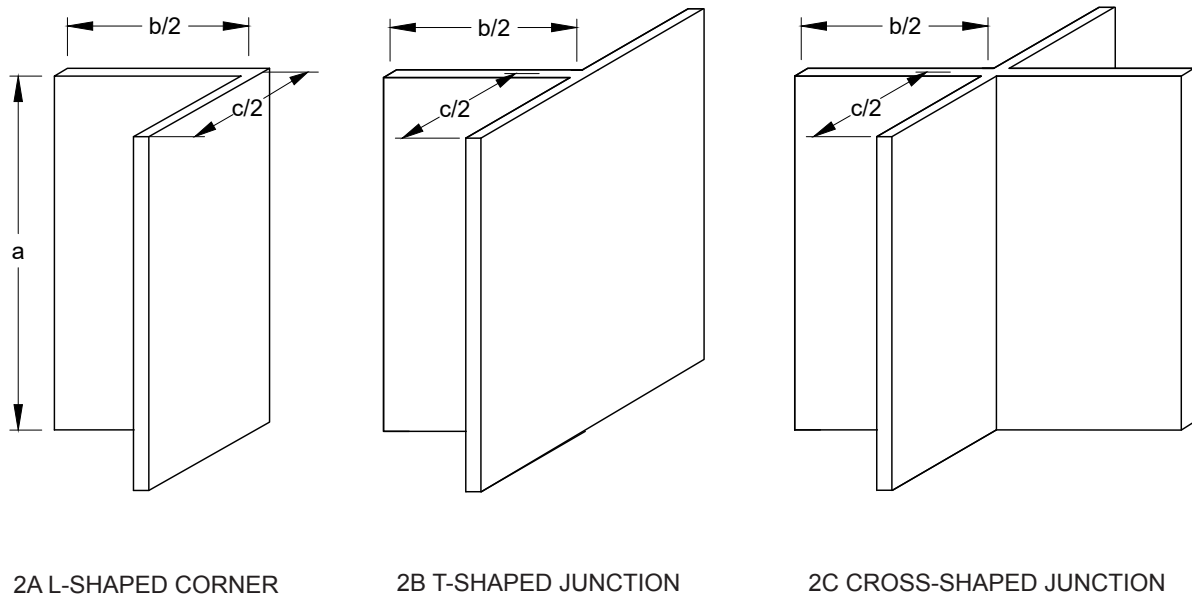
WALL INTERSECTIONS IN MULTI-CELL TANKS
